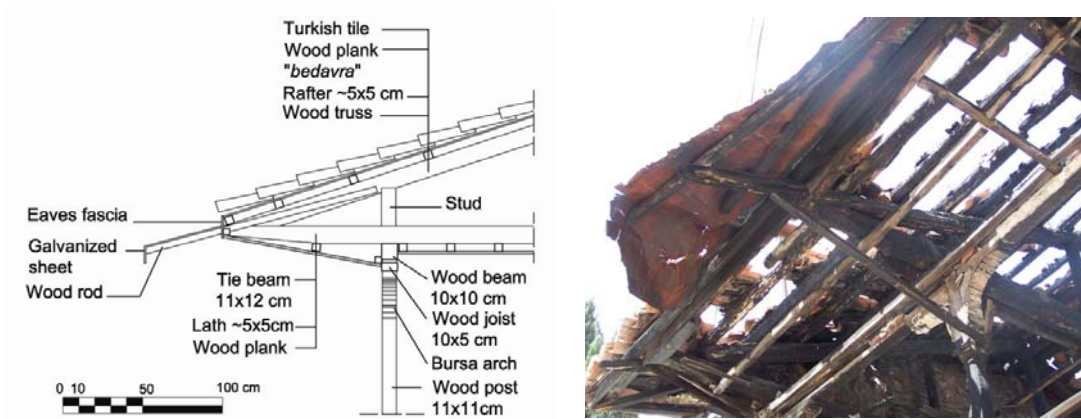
Detail of eaves in front façade (Cami St. No: 12)
